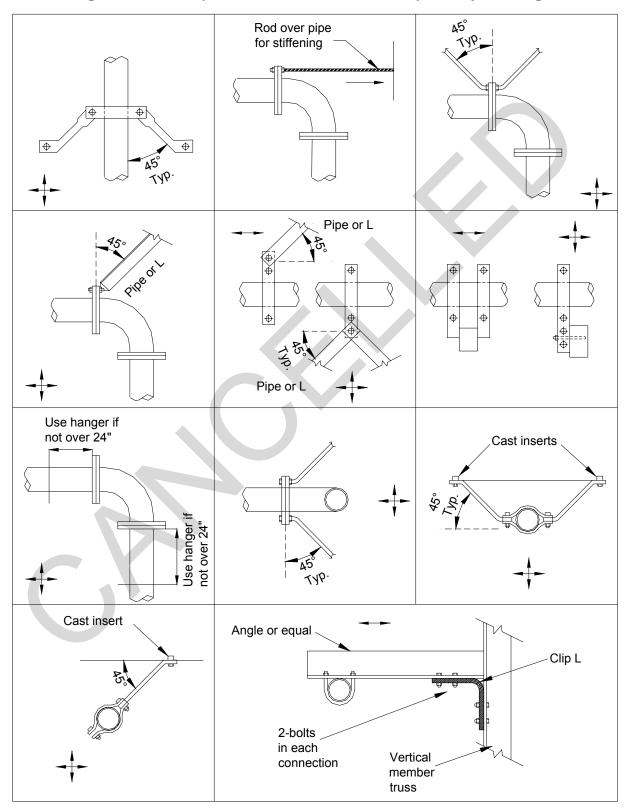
Acceptable Seismic Details for Pipe Sway Bracing
